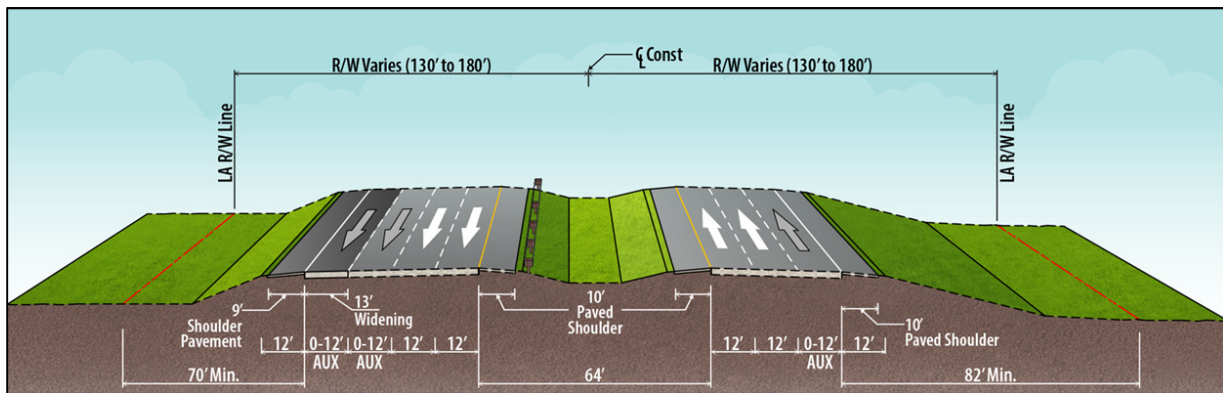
I-275 Mainline Build Alternative Typical Section from south of 54th Avenue I-175 (Segment A)
